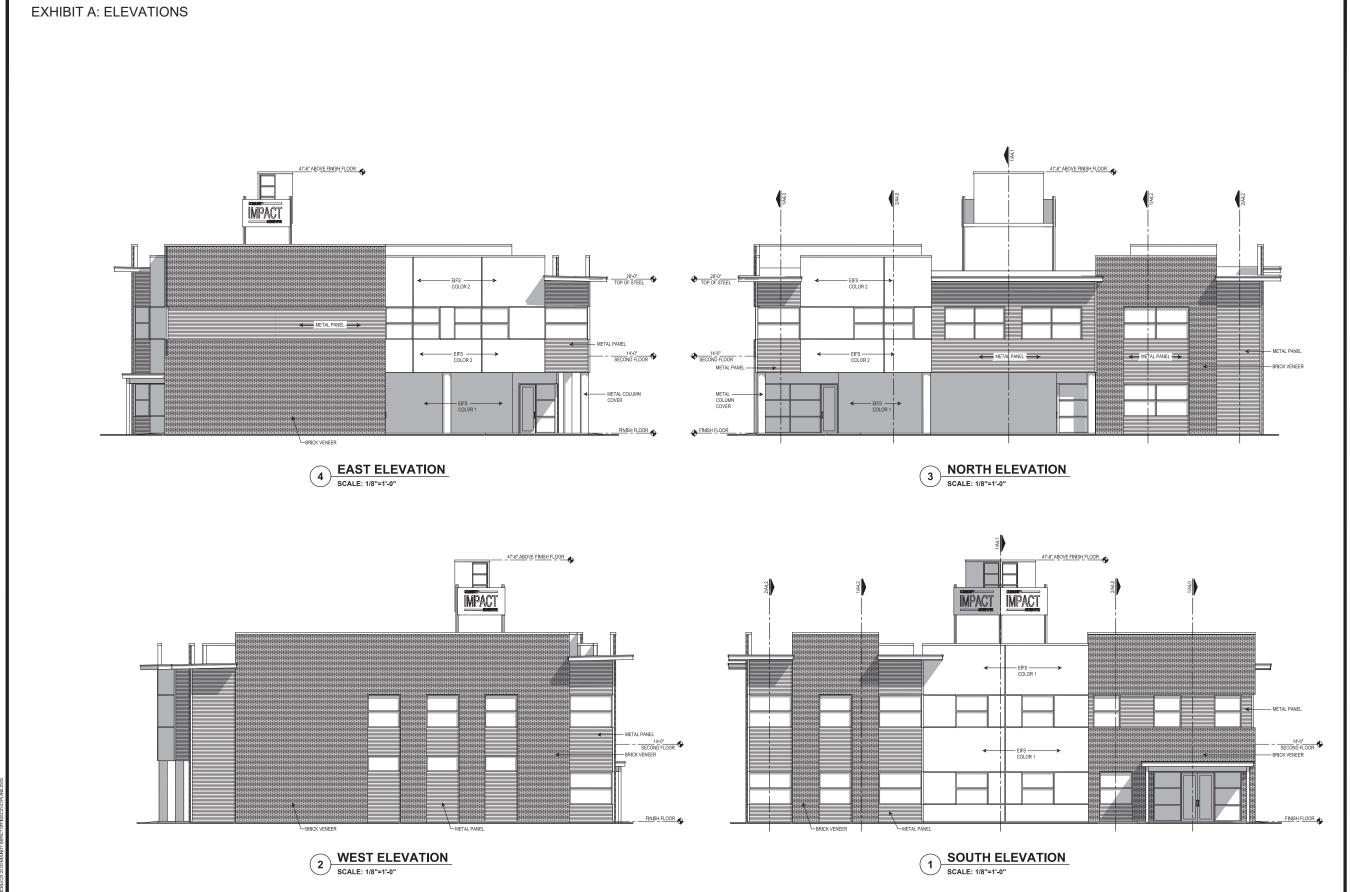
Exhibit A Planning and Zoning Alternative Comprehensive Signage Plan
